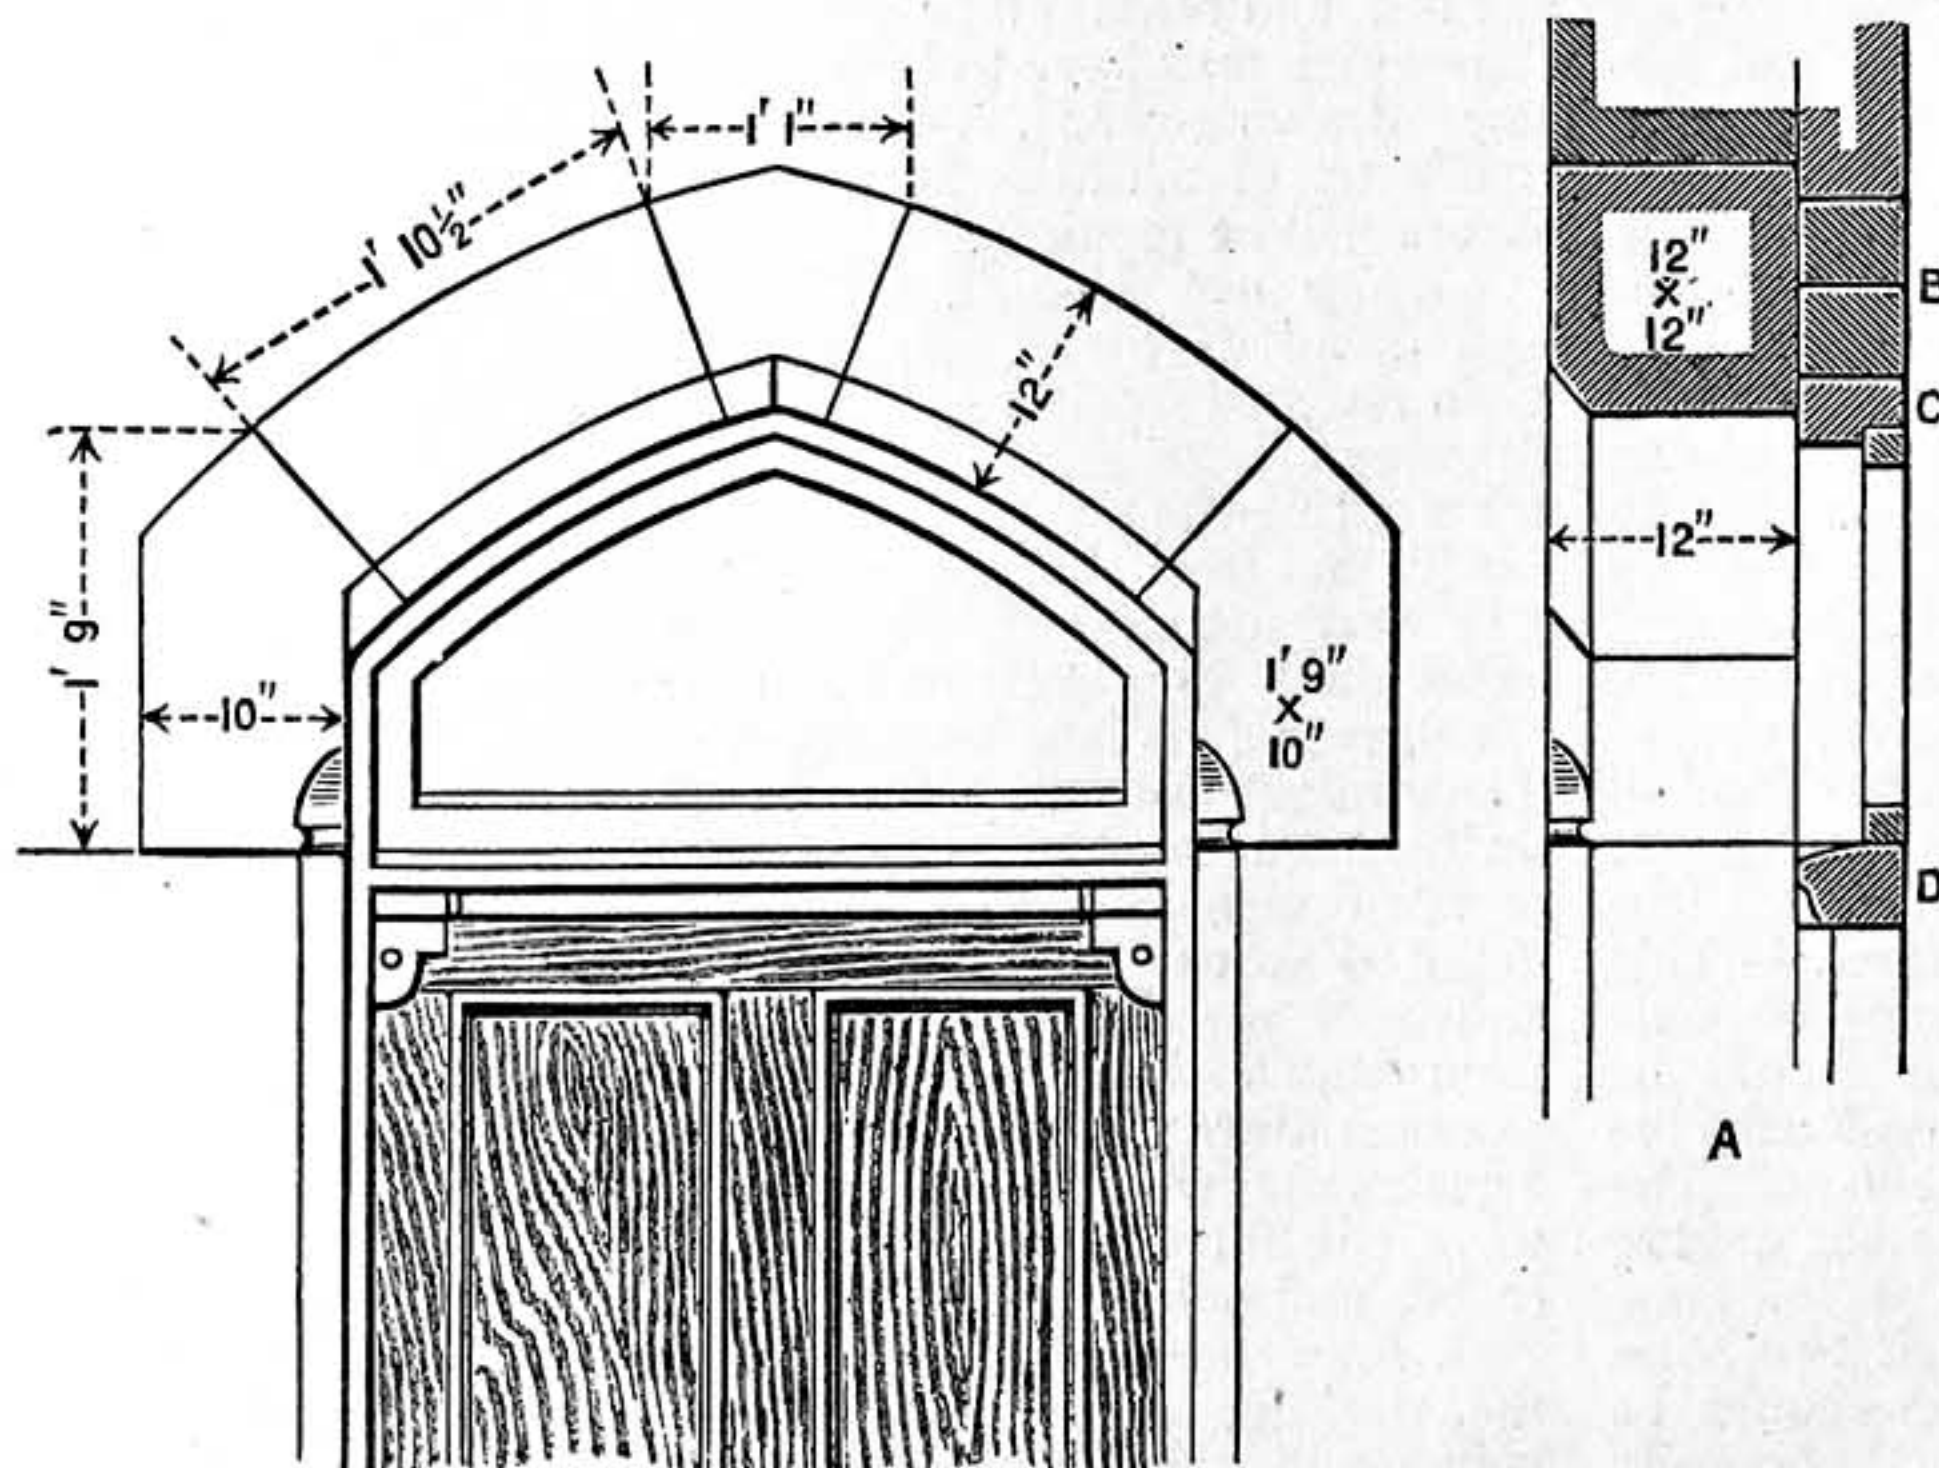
Sketch of Door with Section through Door, etc., at A; B, Brick Arch, two Rims; C, Door Frame, 5 1/2 in. by 3 in.; D, Transome, 5 1/2 in. by 4 in.
